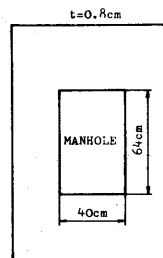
2 a) PLANE VIEW OF TYPICAL GIRDER
